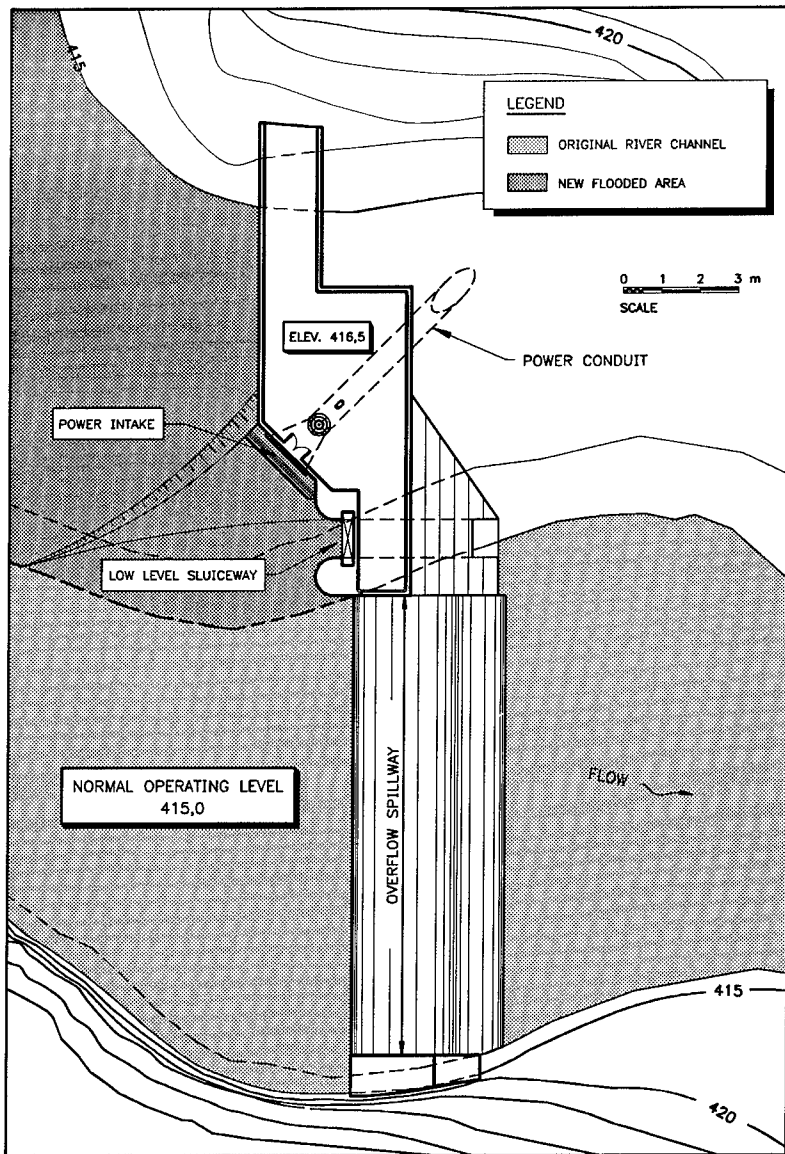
PLAN OF UPSTREAM HEADWORKS
